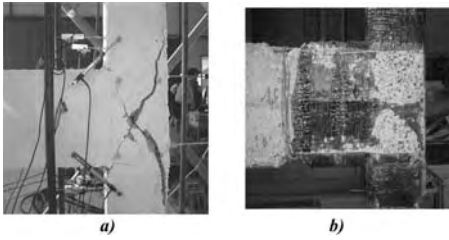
Alternative damage mechanisms; a) shear hinge (as-built T1); b) beam plastic hinge (retrofitted T1B).
